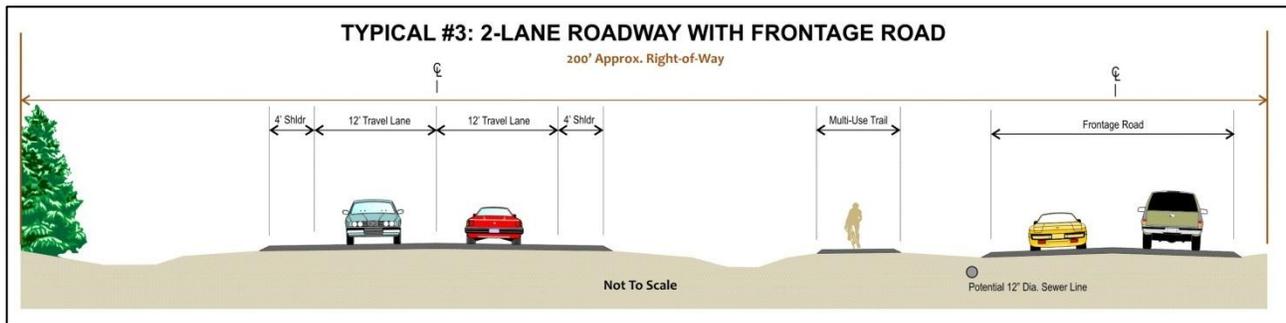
Typical Section #3 – 2-Lane Roadway with Frontage Road
